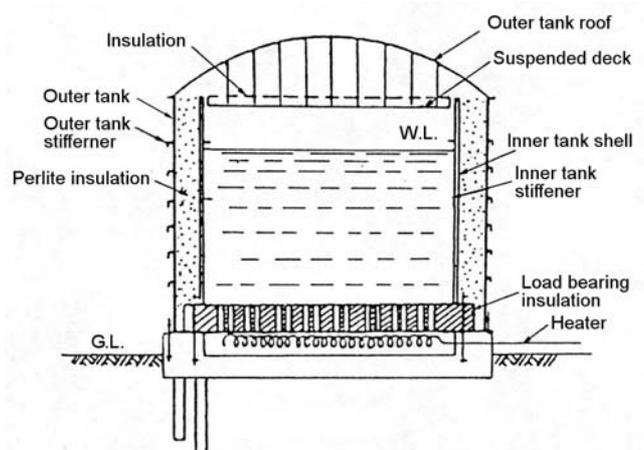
Cross sections over flat-bottom suspended-deck cylindrical tank.
